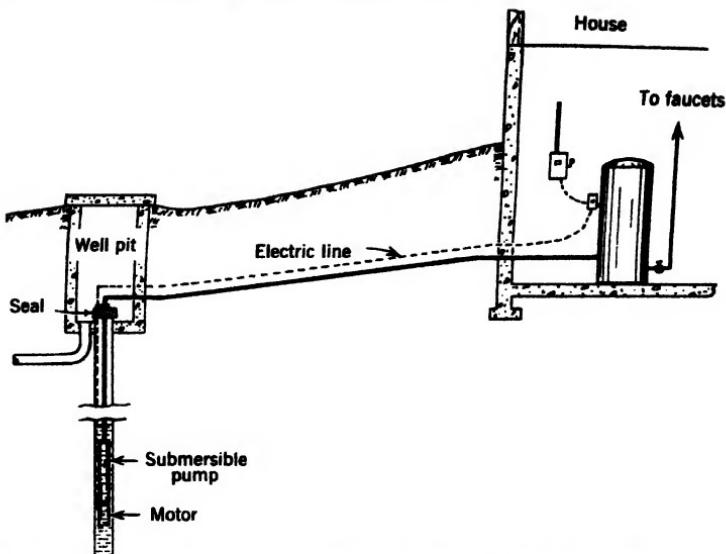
A pressure system using a submersible pump. Pump and motor are in water in the well; therefore operation noises are reduced to a minimum. Good for deep wells to 400 feet. Pump should be selected from manufacturer's Selection Tables. Installation costs comparatively high for wells under 100 feet in depth.
